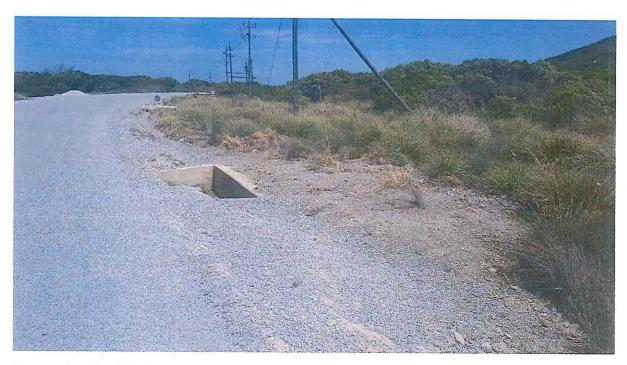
Pipe-culvert inlet after construction prior to rehabilitation
